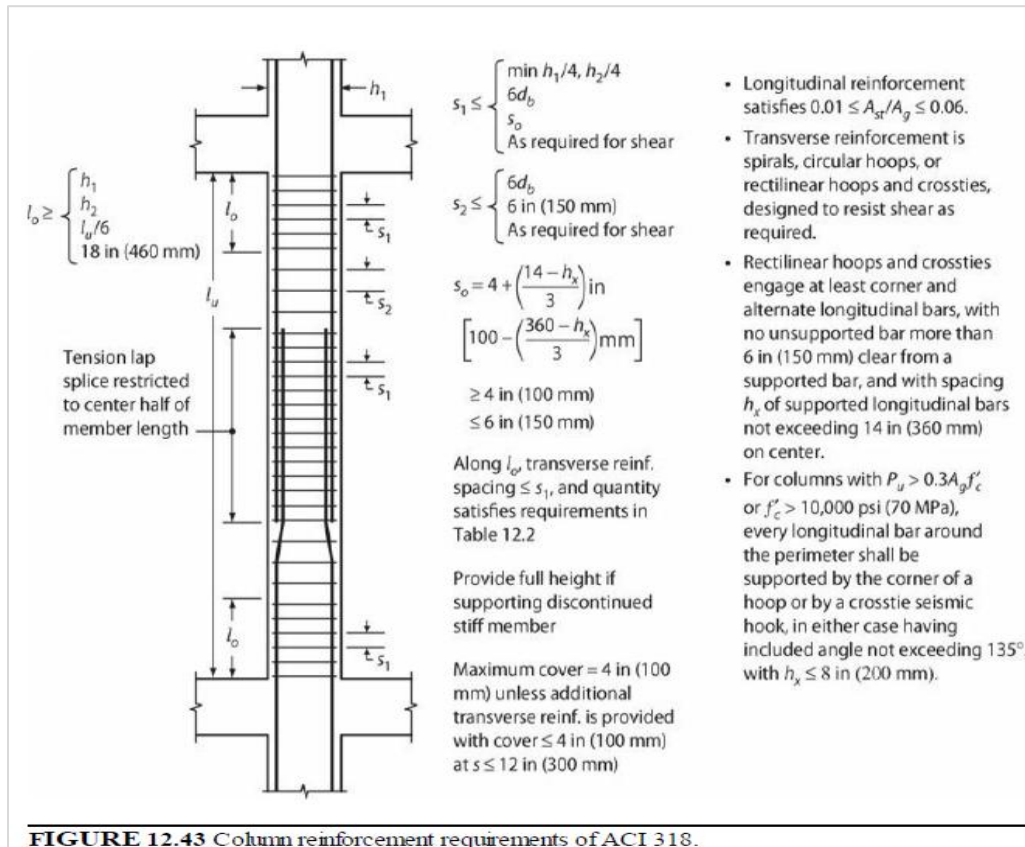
Column reinforcement requirements of ACI 318.
